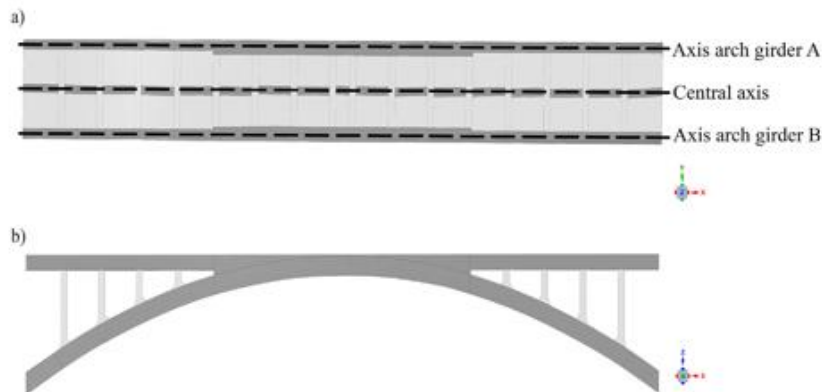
As-built CAD model obtained by the proposed method: a) plant view (arches A and B); and b) elevation view.
